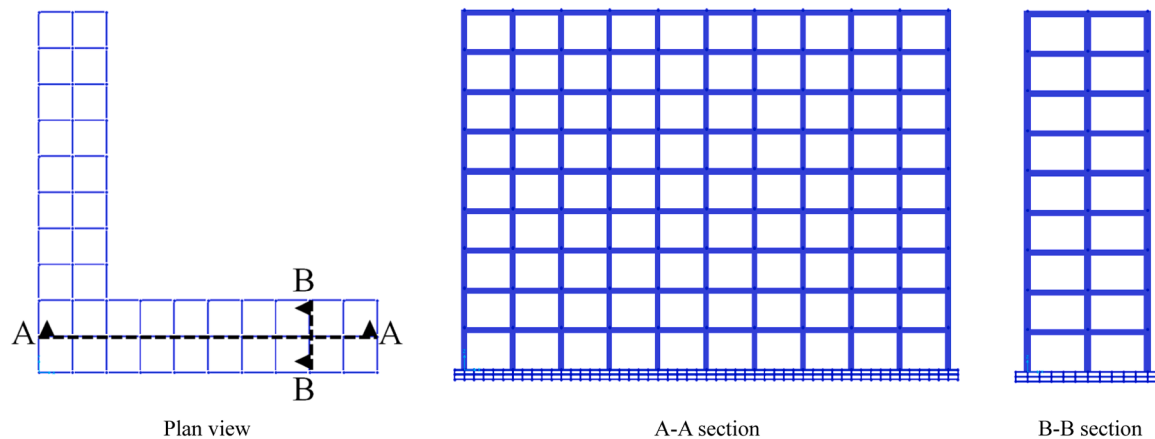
Plan and wing views of the investigated L-shaped structure.
